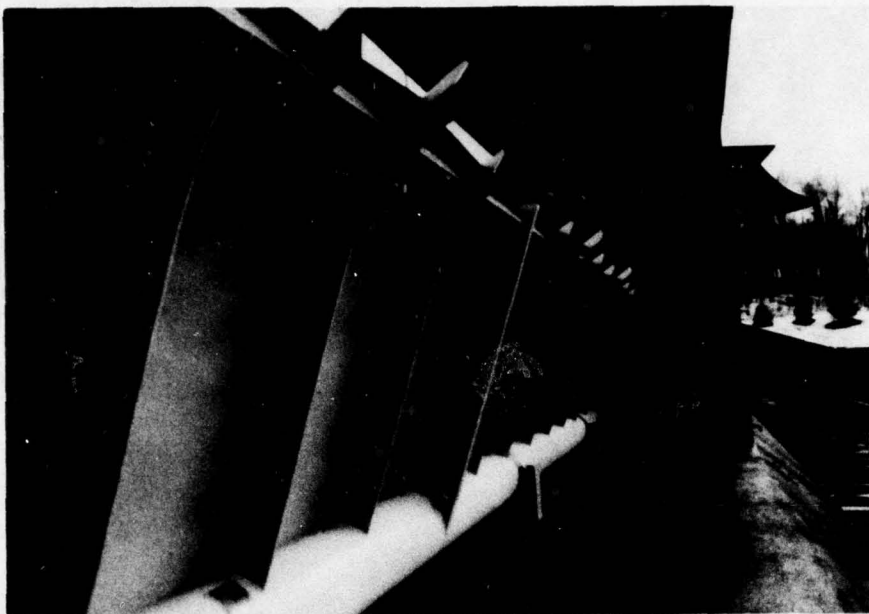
View of Downstream Side of Bascule Gate No. 1
